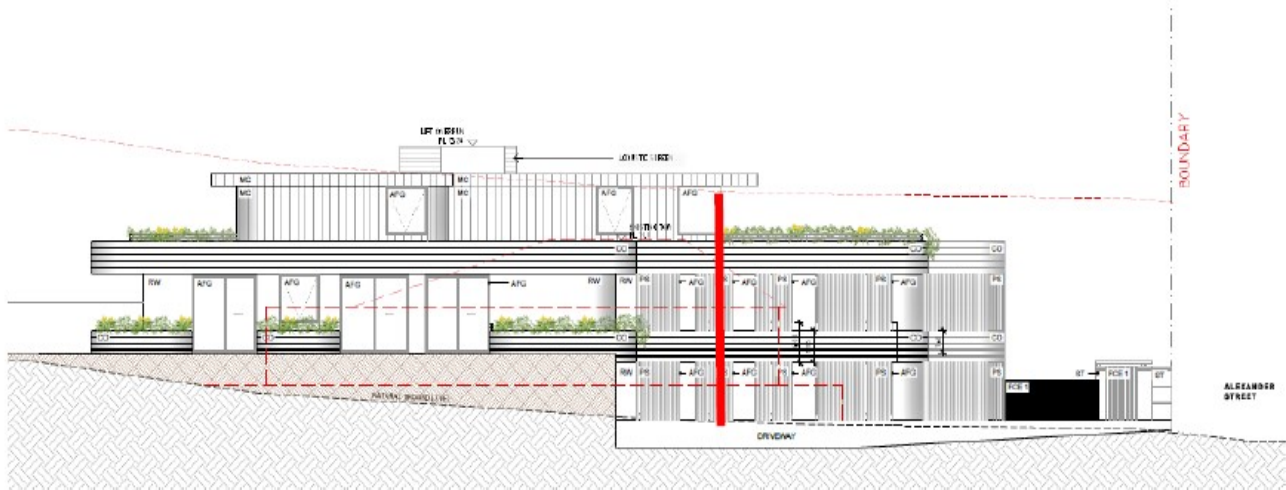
Plan extract showing the 3 storey building height as viewed from the east
